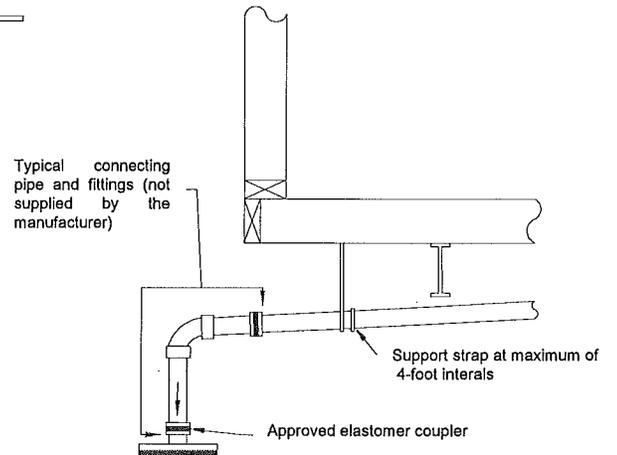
DRAINAGE SLOPES AND CONNECTIONS
